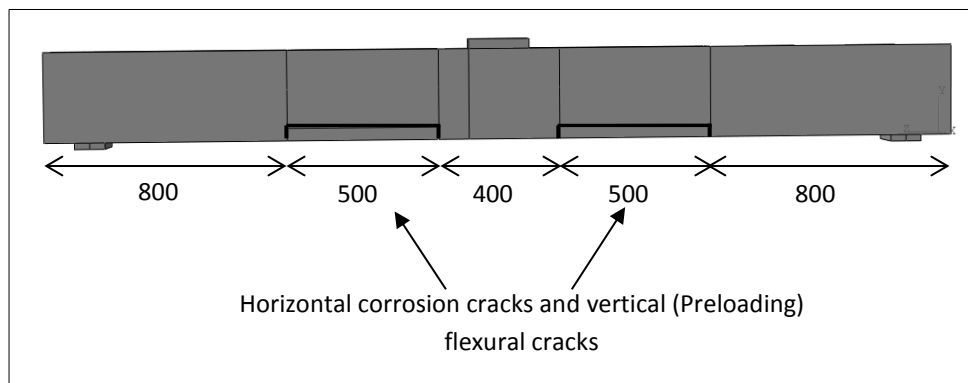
Cracks created at concrete cover plane of corroded beam in (mm)
